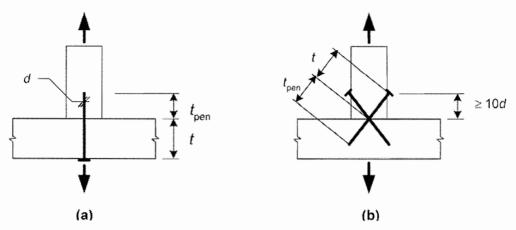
(a) Nailing perpendicular to grain and (b) slant nailing
